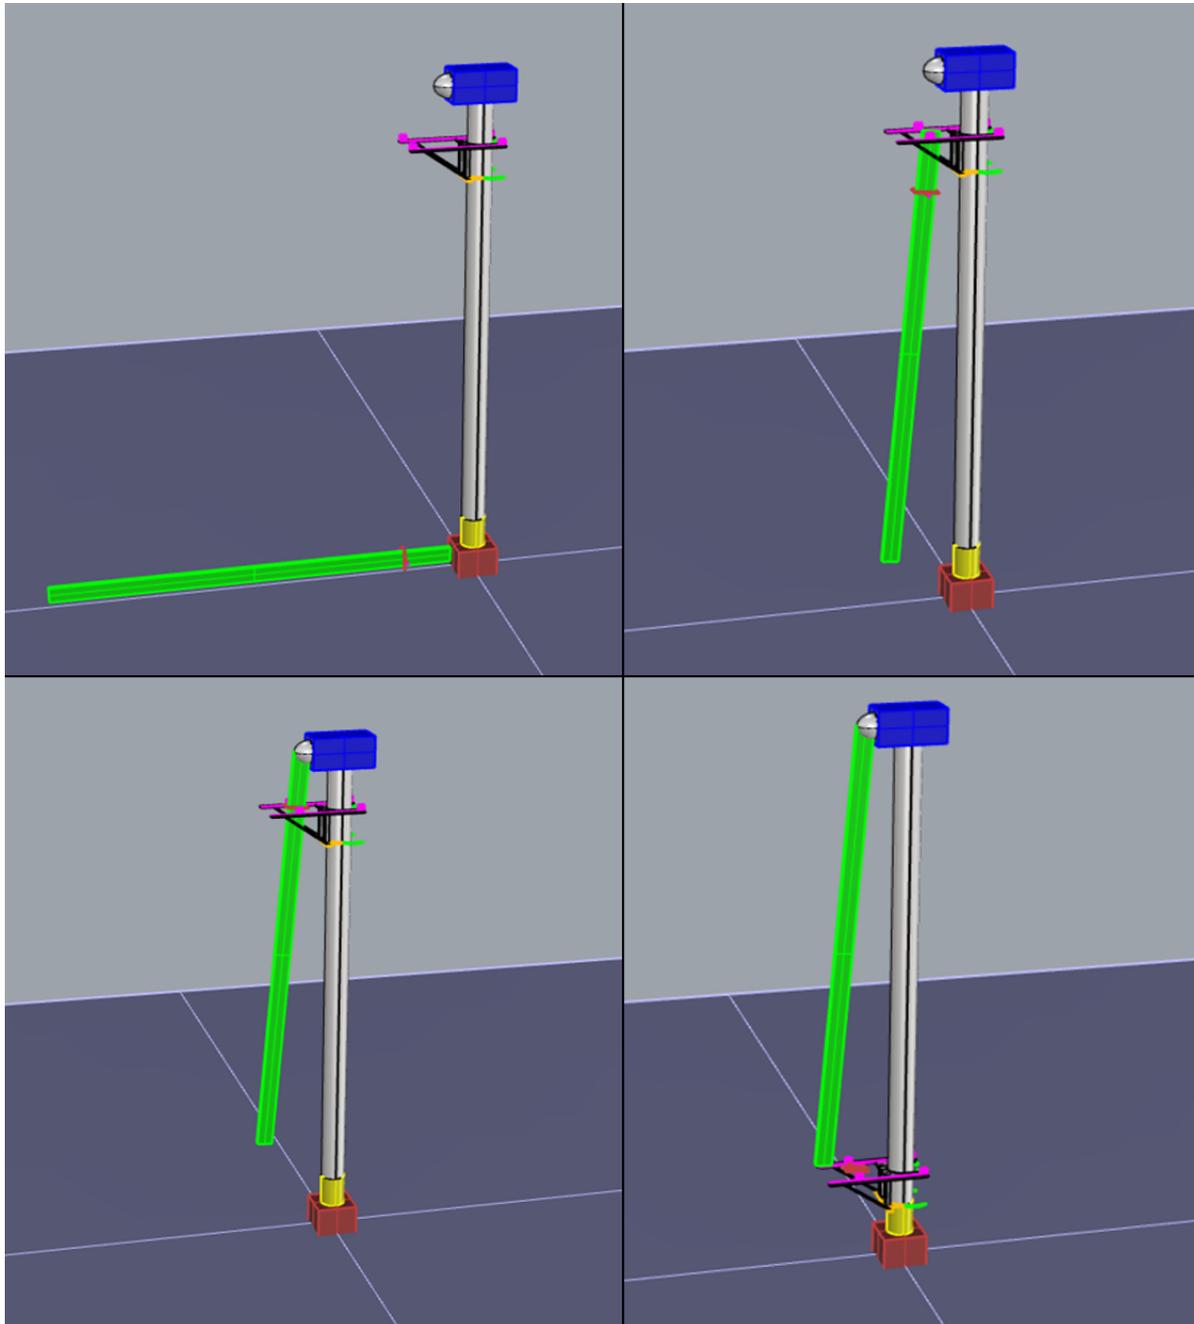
Blade installation using the elevator platform, top left blade on barge, top right blade during lifting, bottom left Blade during mating, bottom right platform at lowest position so that blade can rotate.
